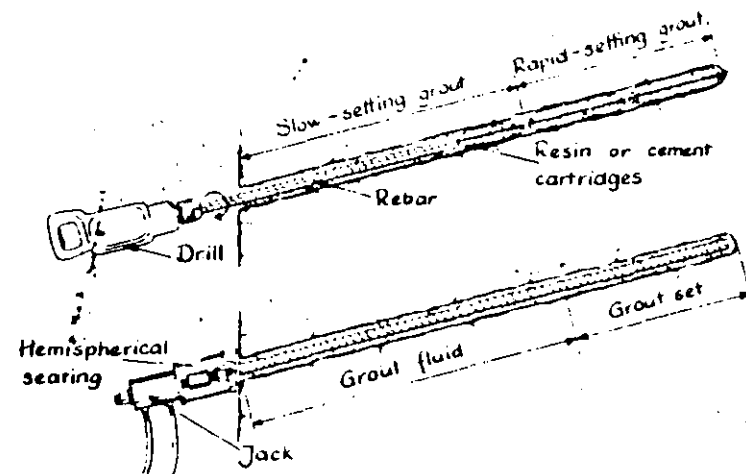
Principle of installation and tensioning of a fully grouted rockbolt using an hydraulic bolt tensioner.
